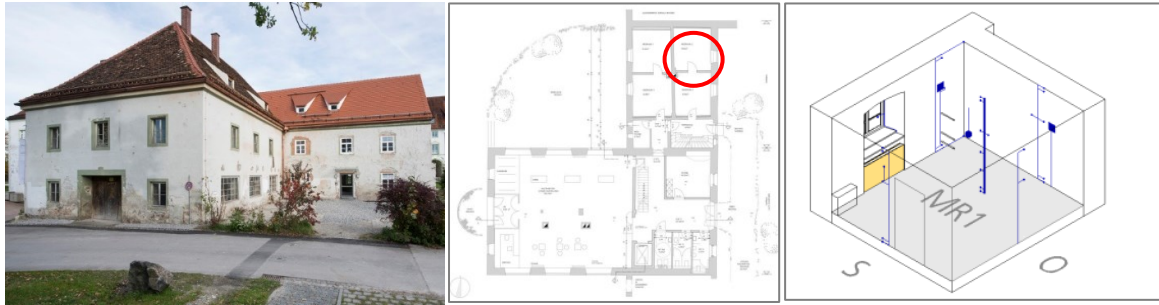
VIEW OF THE SELECTED BUILDING AND DETAILS OF THE ROOM USED AS DEMONSTRATION
